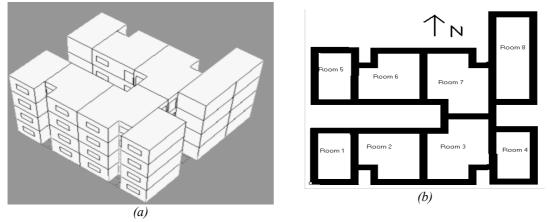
Plan of the building (a) Isometric view, (b) Top view
